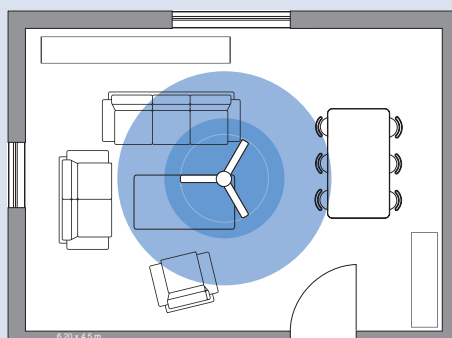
Summer ventilation in the living/dining room with a ceiling fan Ø 132 cm
